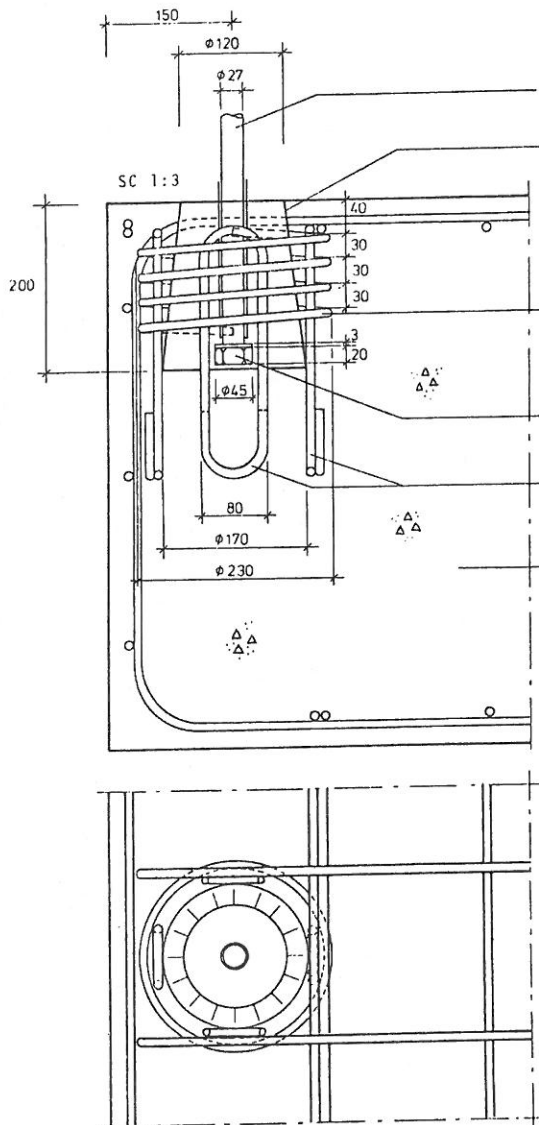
Anchor bolt arrangement in static tests of drilled holes No SD 3:1 and SD 2:4
